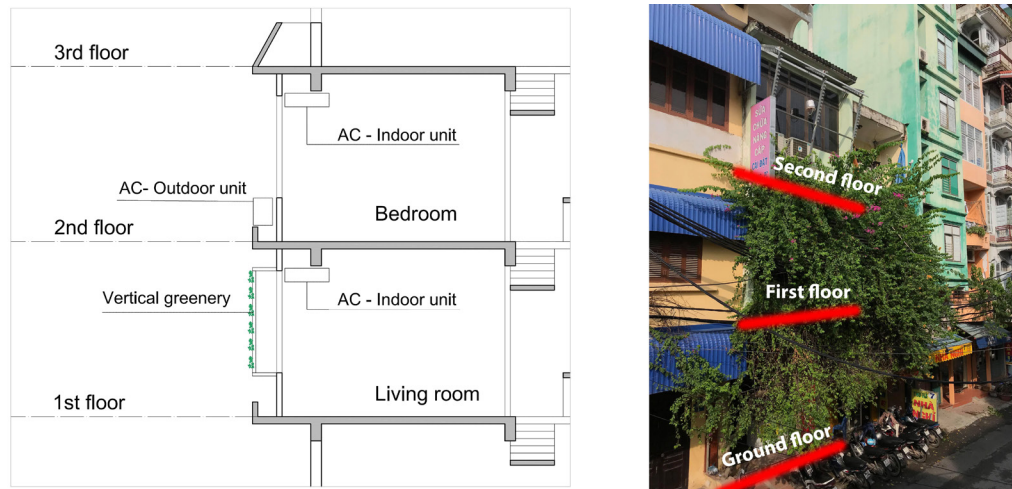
Existing Vietnamese building for experiment. Left: cross section & floor plan, Right: outside view
